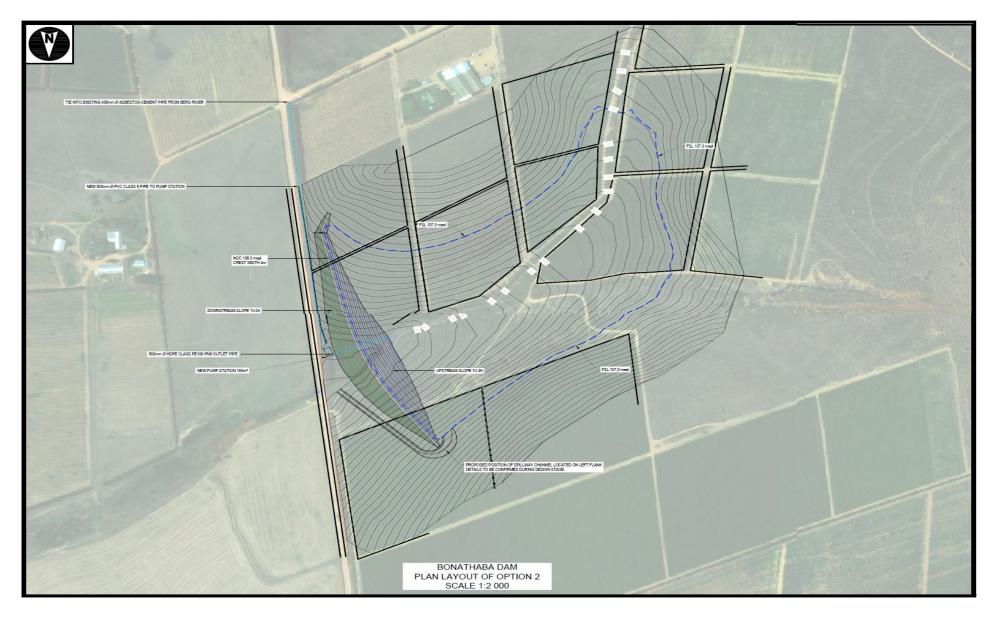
Proposed, preferred site plan layout. Source: Ingerop Consulting Engineers and Project Managers, (2020). Note, map direction (i.e. north direction). See Appendix 2 for more information.
